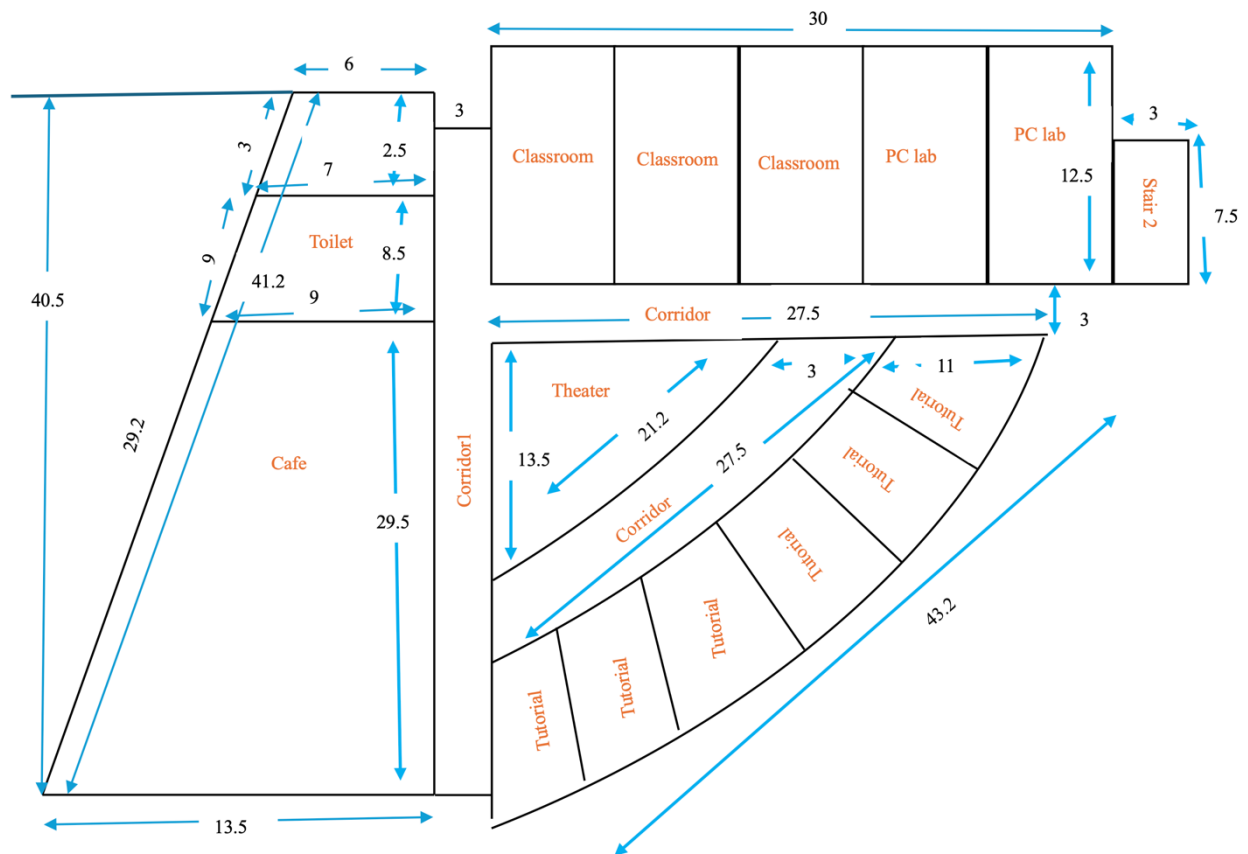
Zoning layout of the teaching building at Dundalk Institute of Technology
